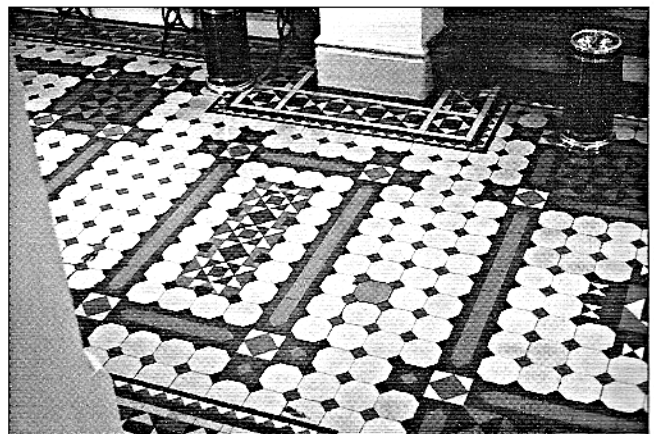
The first floor of the courthouse has a single corridor that runs from one side of the building to the other. This general view of a portion of the first floor tile installation, taken from a stairway leading to the courthouse attic, shows some of the many decorative geometric tile panels Elliott incorporated into its design.
